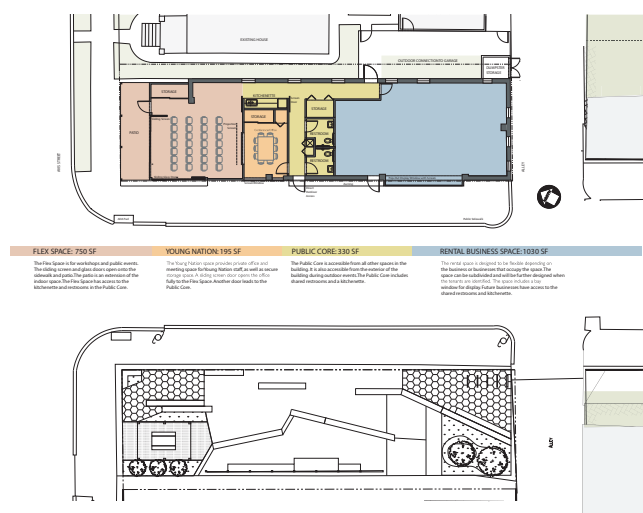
Avis + Elsmere floor plan along with the skate plaza site plan that is scheduled to begin construction in the Fall 2019. Image credit: By Authors
